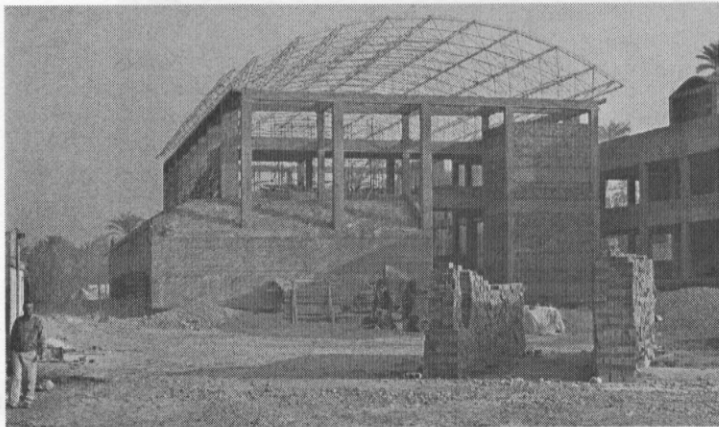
The new site museum, now with the struts of its roof in place (10 December 2006).
